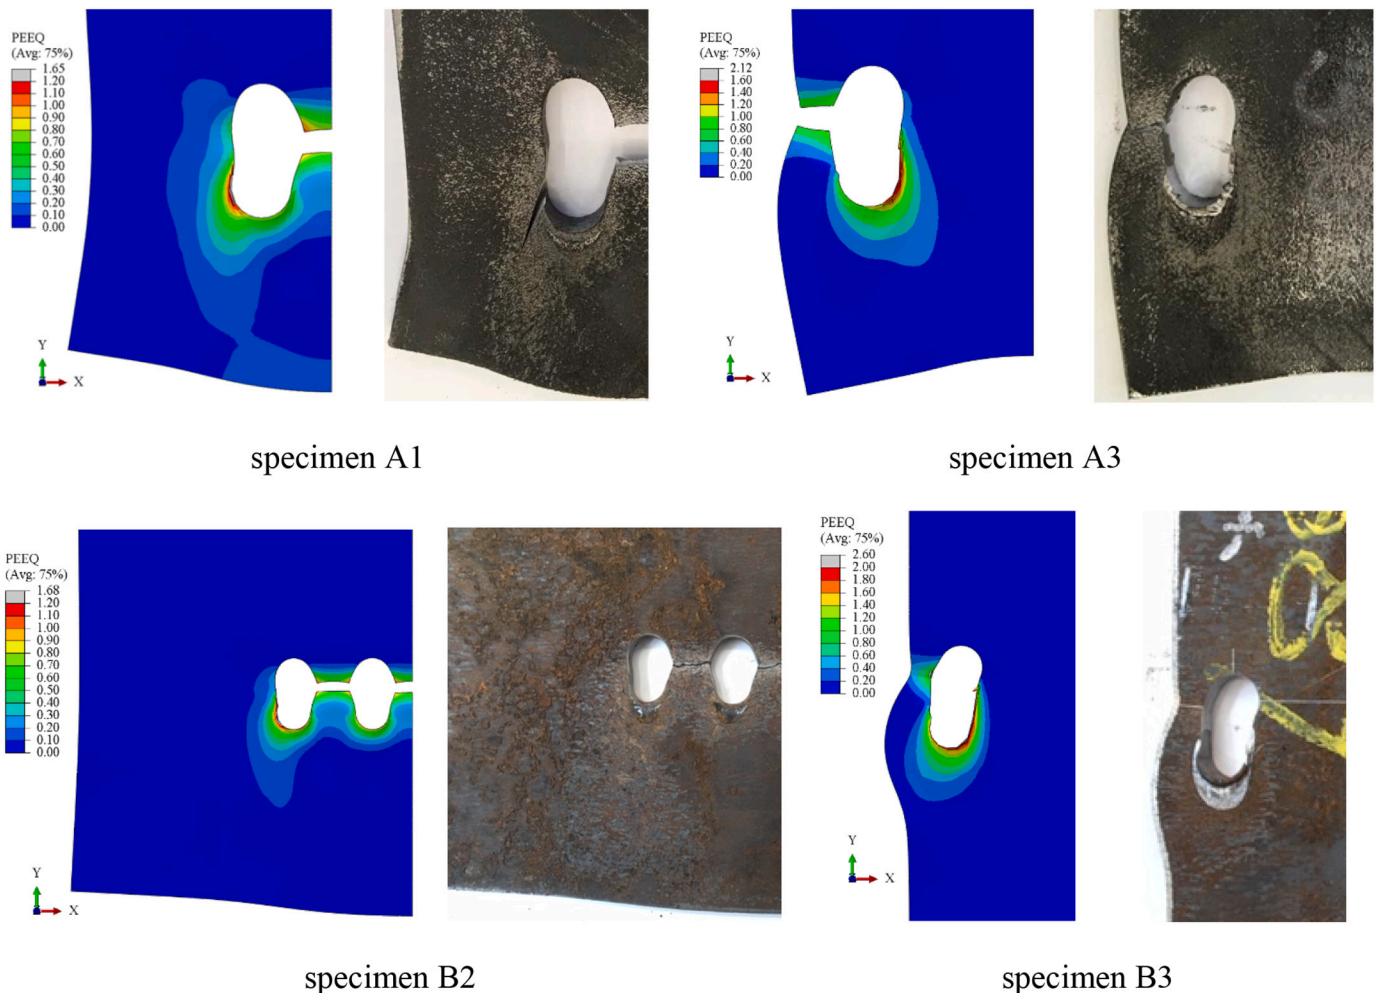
Failure modes of connections A1, A3, B2 (one half of the specimen) and B3 (detail at bolt hole).
